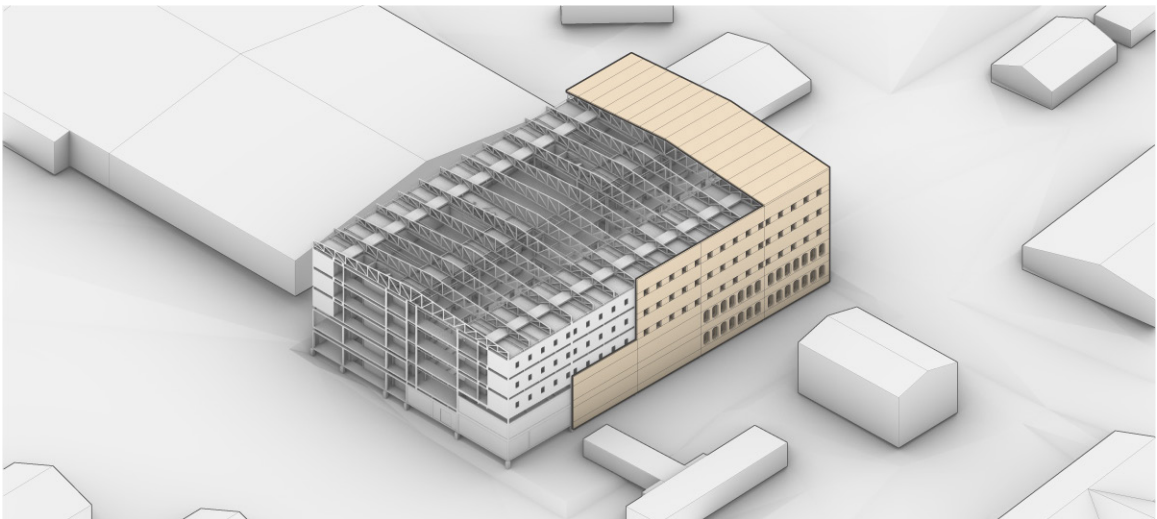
Once all sections are complete the external insulation and cladding can be installed.
